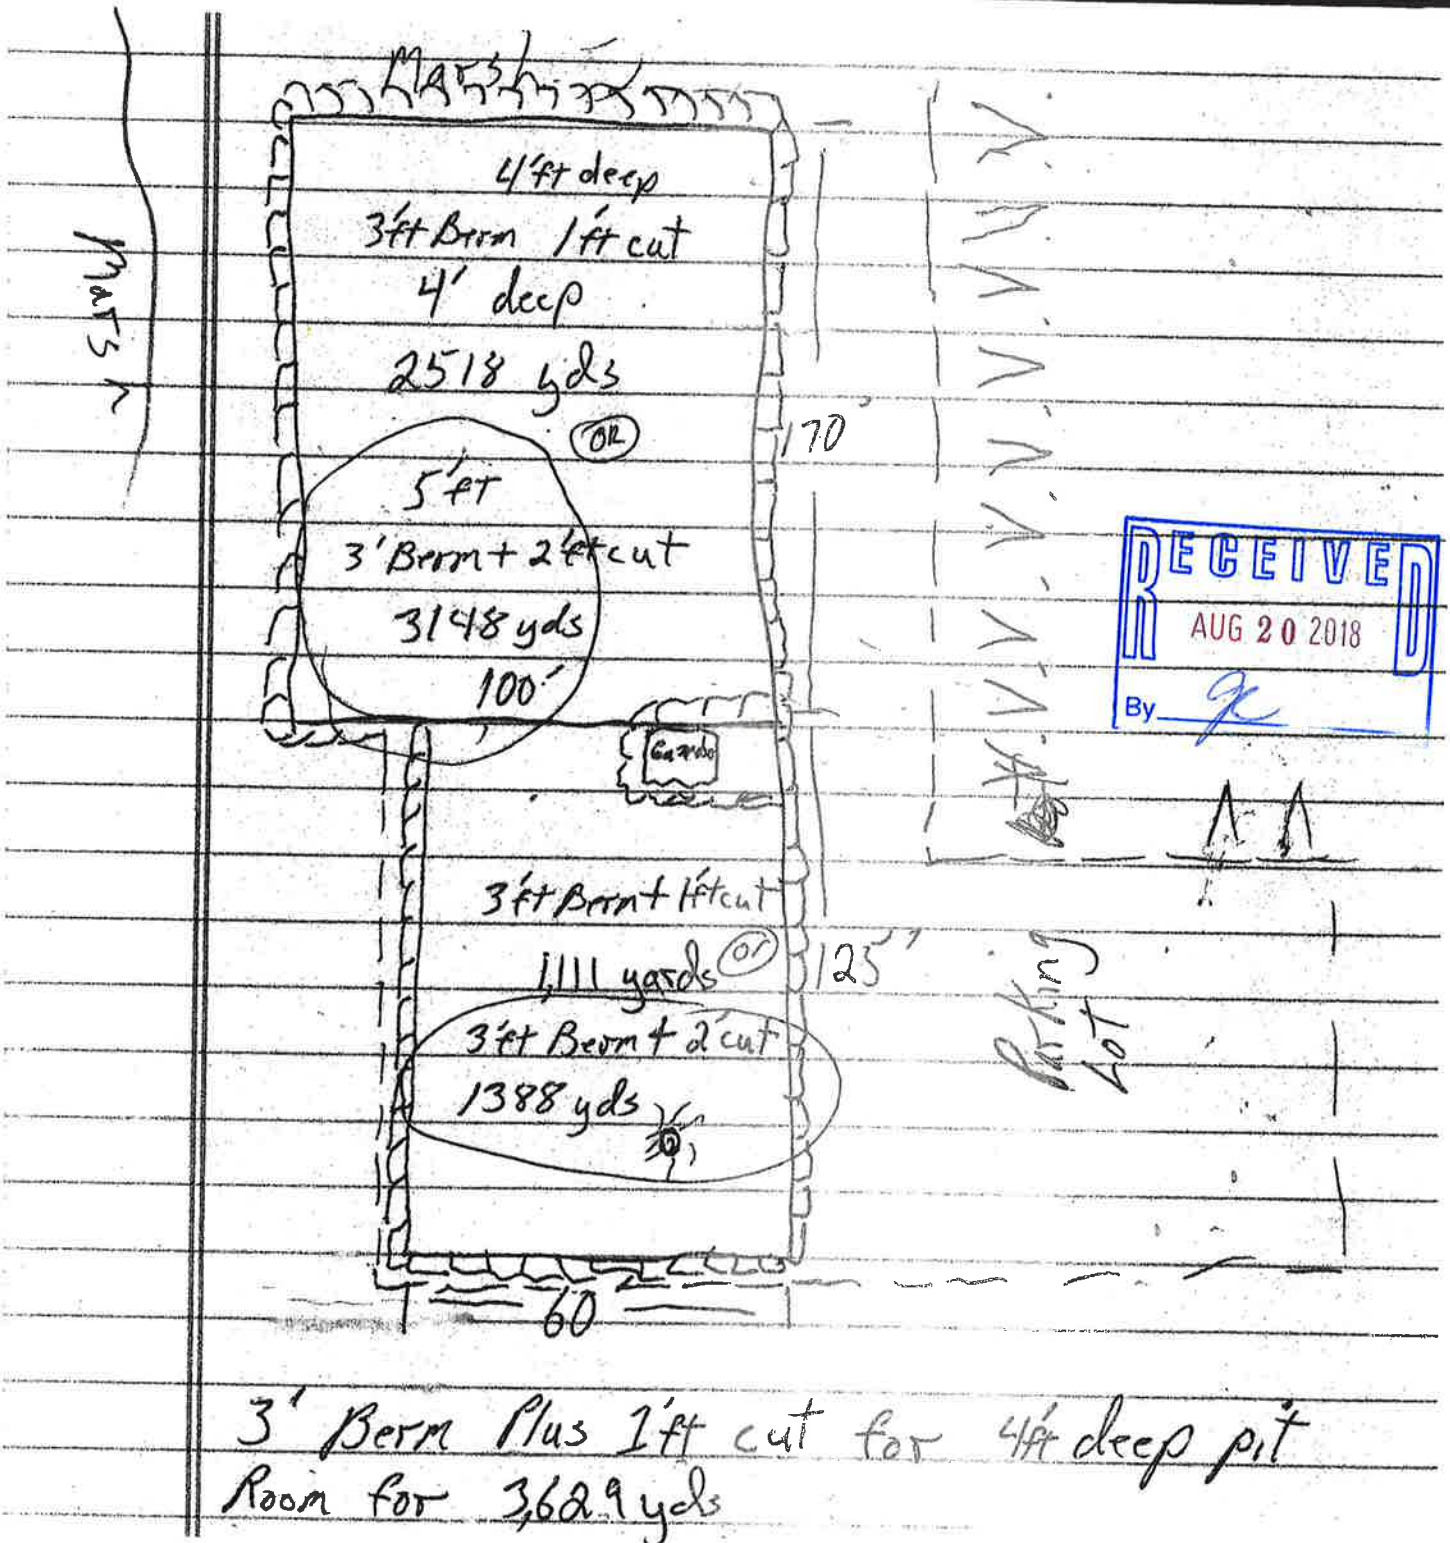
Plan view sketch of proposed disposal area (prepared by George Apple, Apple Marine Construction, Inc., dredging contractor).
